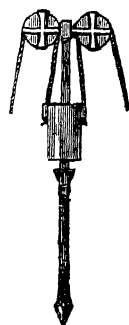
THE DRIVE-POINT AND MONKEY GEAR.
